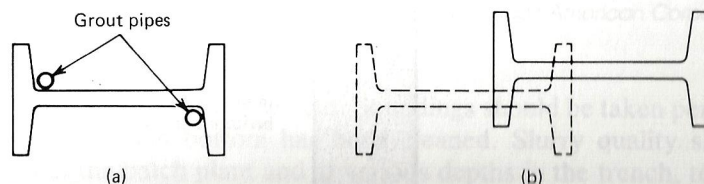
Beam method of constructing thin wall slurry cutoff. (a) Beam is vibrated to desired depth, and grout is pumped into the space created as the beam is extracted. (b) Subsequent penetrations of the beam are positioned to provide continuous cutoff.
